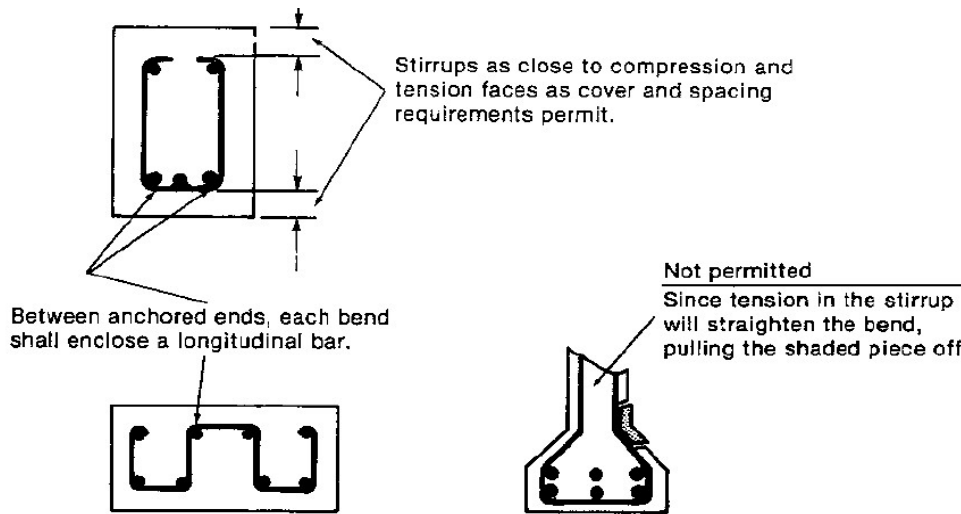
General requirements for anchorage of stirrups, continued.
